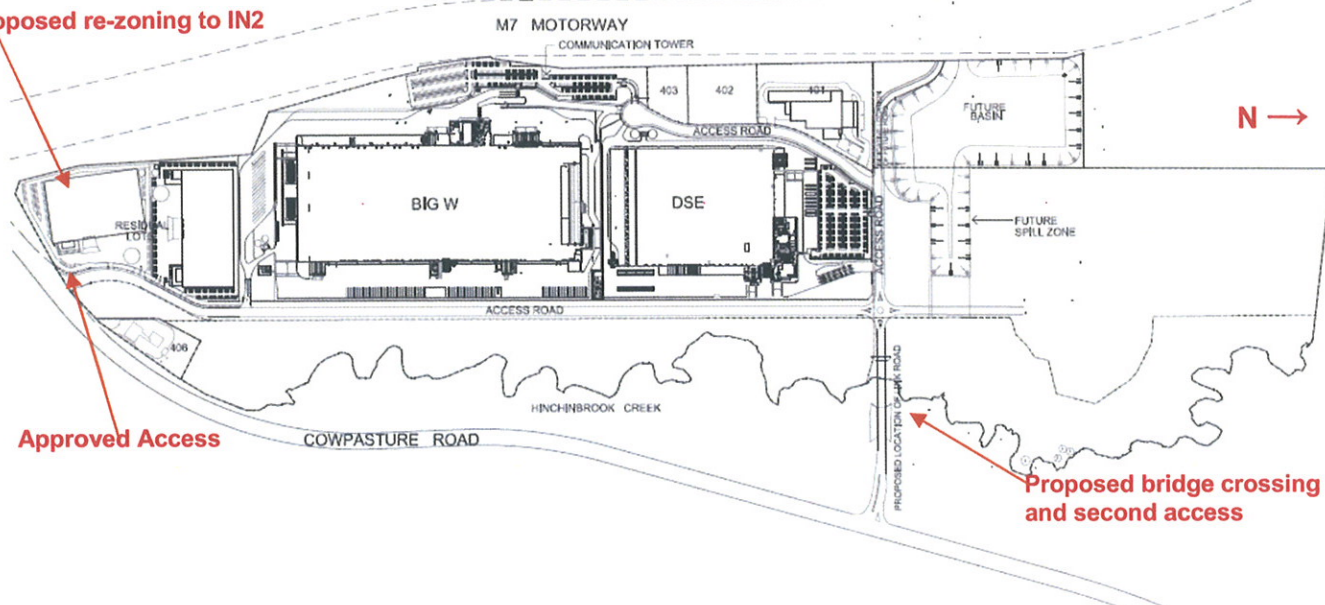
Proposed Hoxton Park (Len Waters) Industrial Estate Layout
